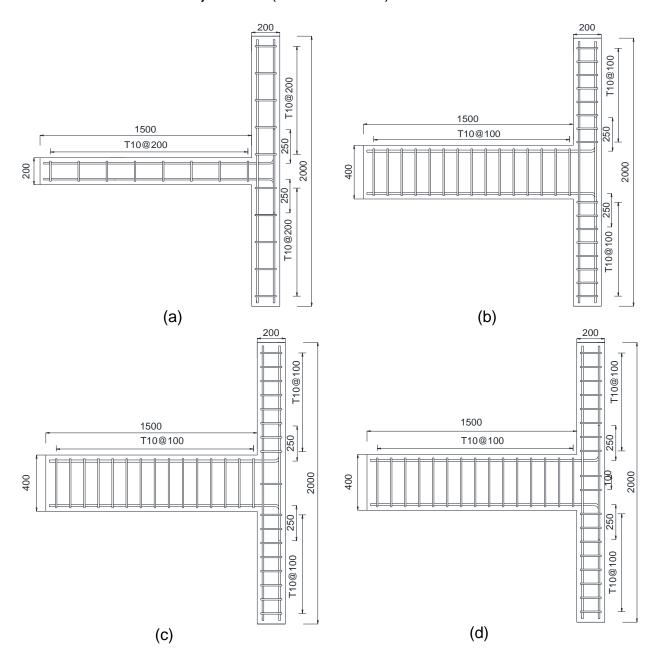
Details of reinforcement and geometry of the specimens: (a) specimen HKOL-200; (b) specimen HKOL-400; (c) specimen HKOL-400-L; (d) specimen HKOL-400-LL (dimensions in mm)
